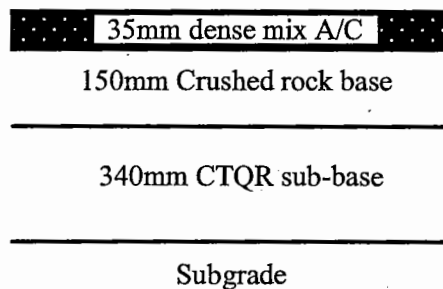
PAVEMENT CONFIGURATION FOR GAWLER BYPASS STAGE II
